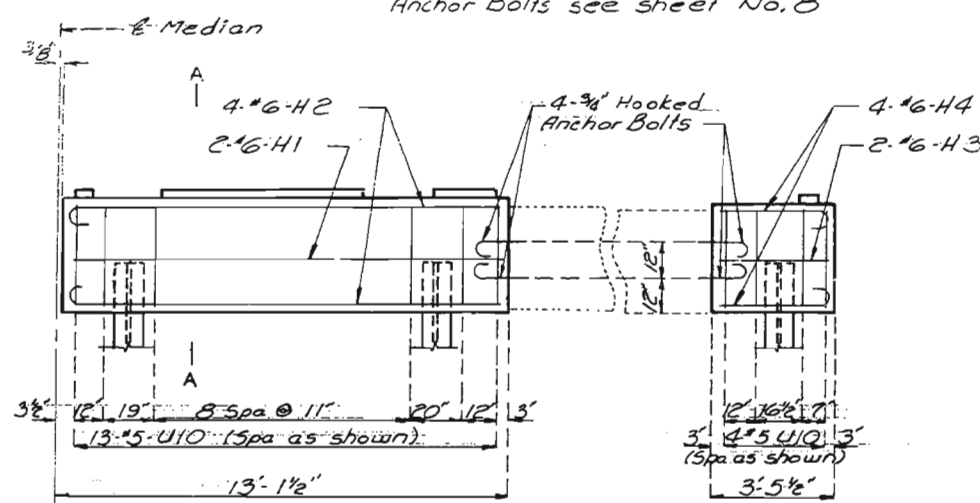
DETAILS OF END BENT NO. 4 (WEST BOUND LANE)
